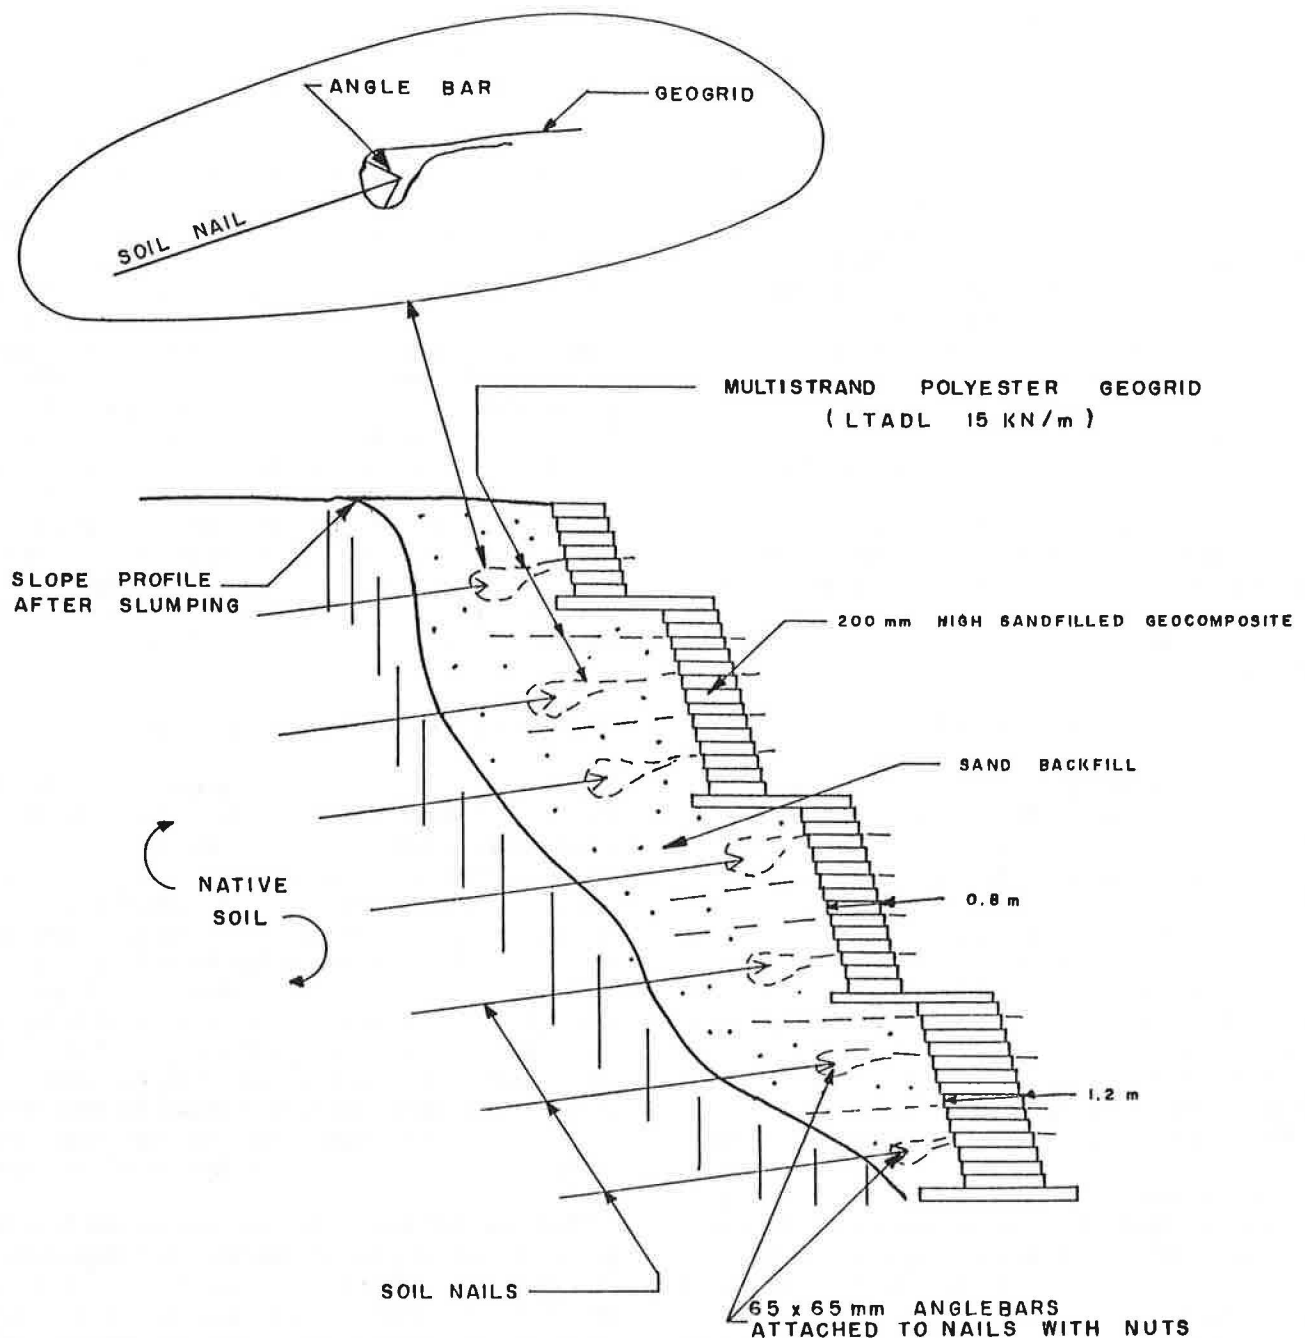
Schematic illustration of slope facing construction using geocomposite.
